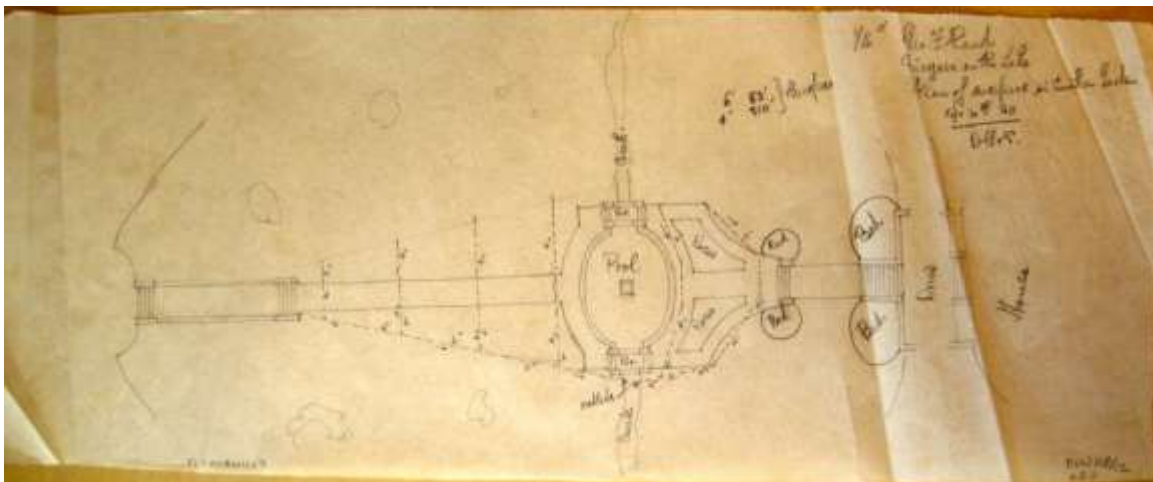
Dunington-Grubb Landscape Design, 176 John Street East, Dunington-Grubb Stensson Fonds, Centre for Canadian Landscape Architecture Archives, Guelph
